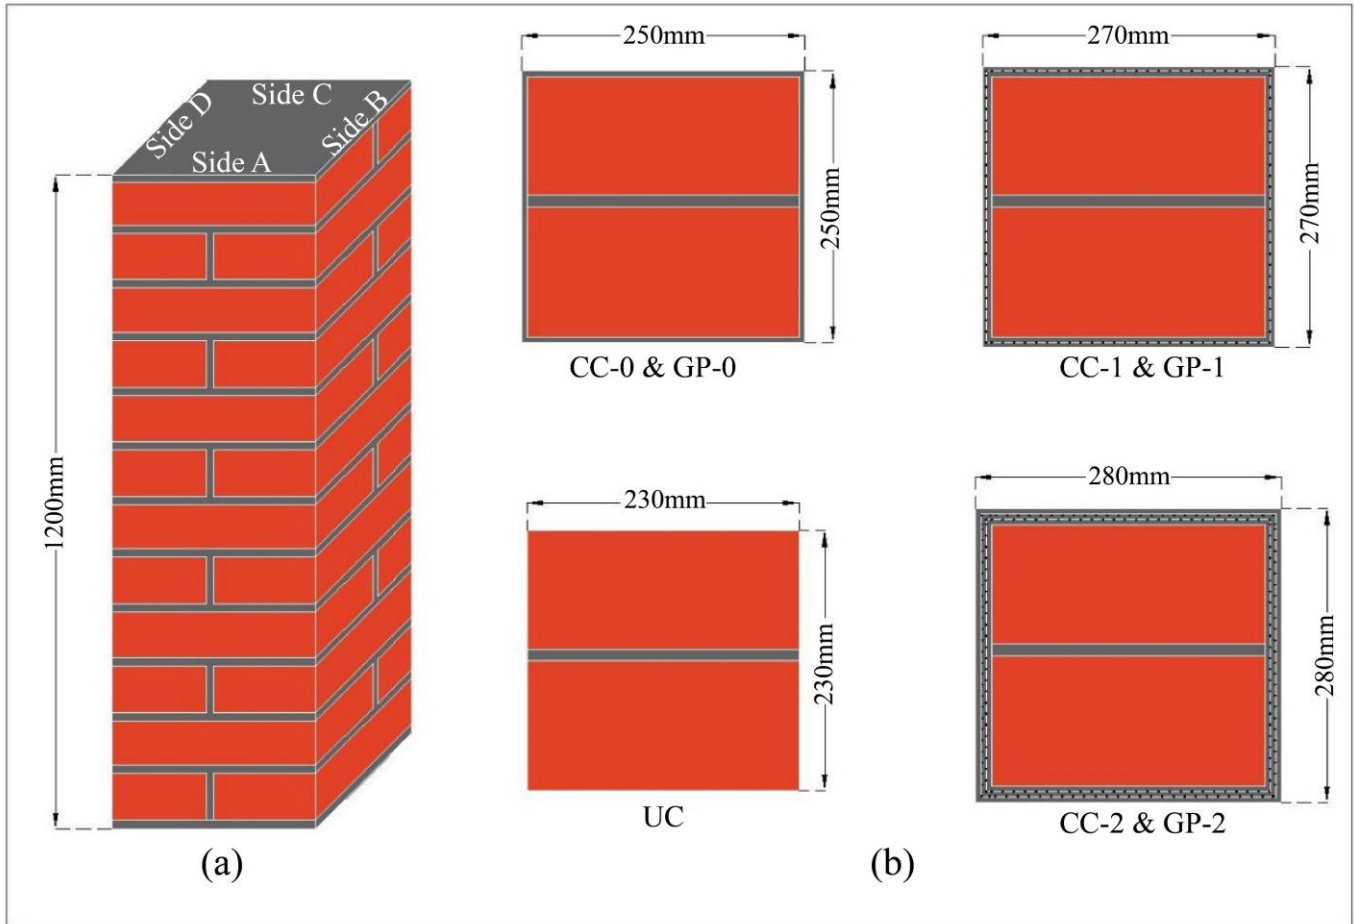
Geometry of the masonry column (a) Elevation, and (b) Cross section.
